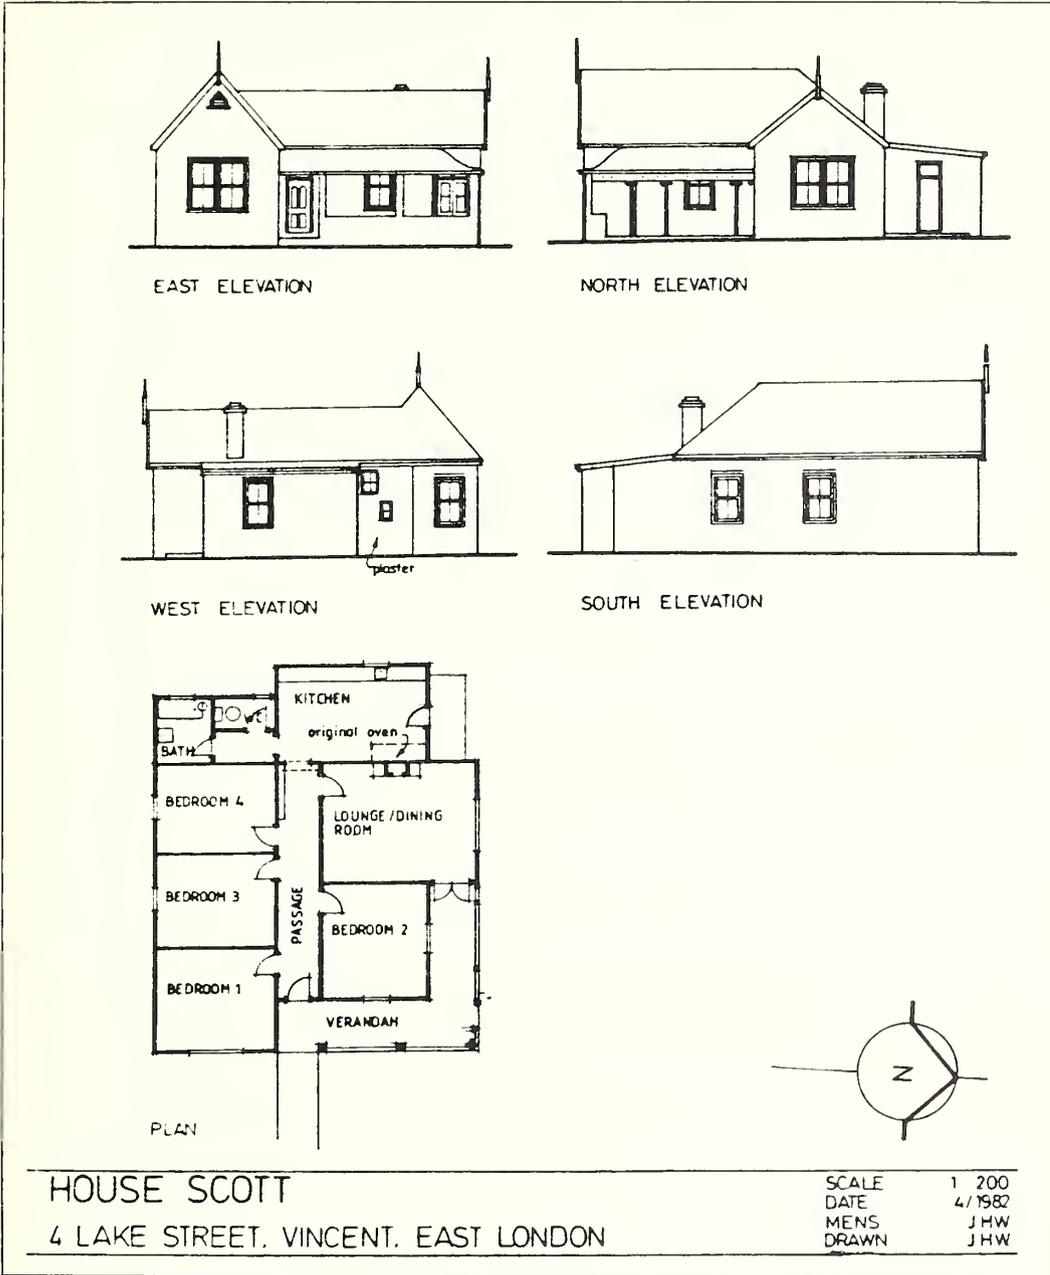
Plan of 4 Lake Street. Drawn by J. H. Watson.
